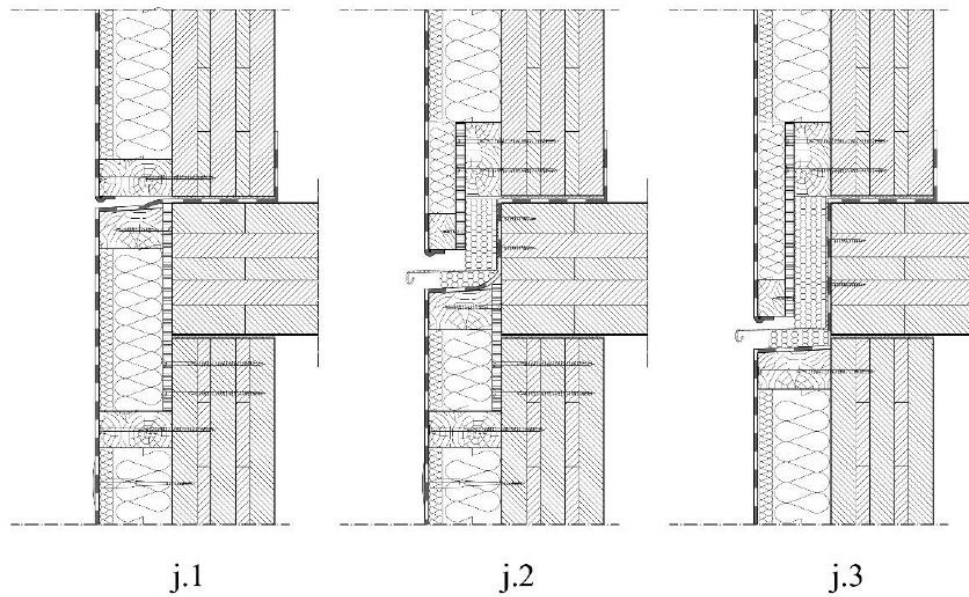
Horizontal joint positioning options (vertical cross-section) [5]
